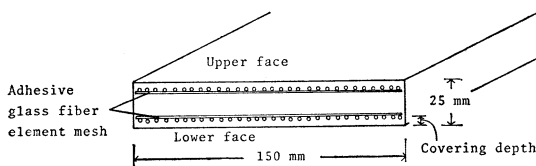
Section of the adhesive glass fiber reinforced gypsum plank
